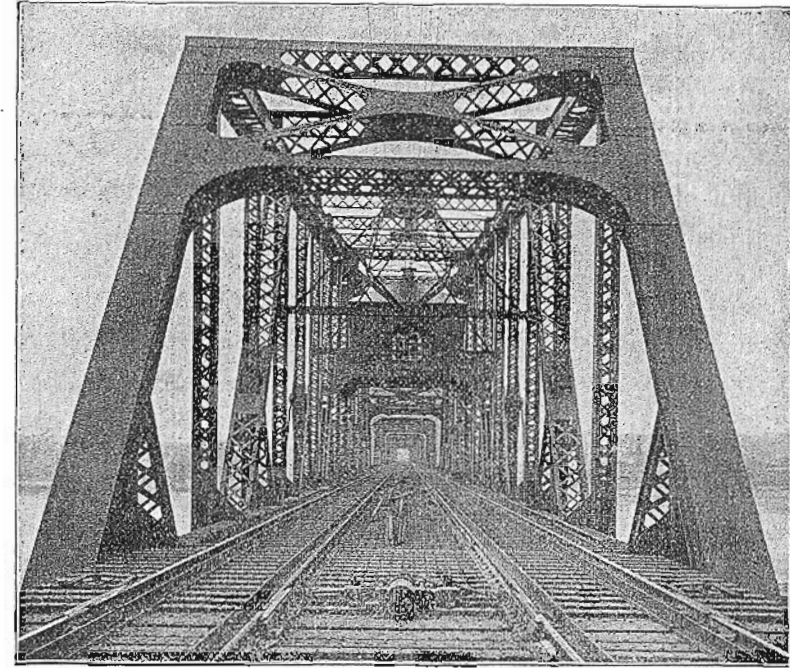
Portal of United States Bridge at Rock Island, Ill.
